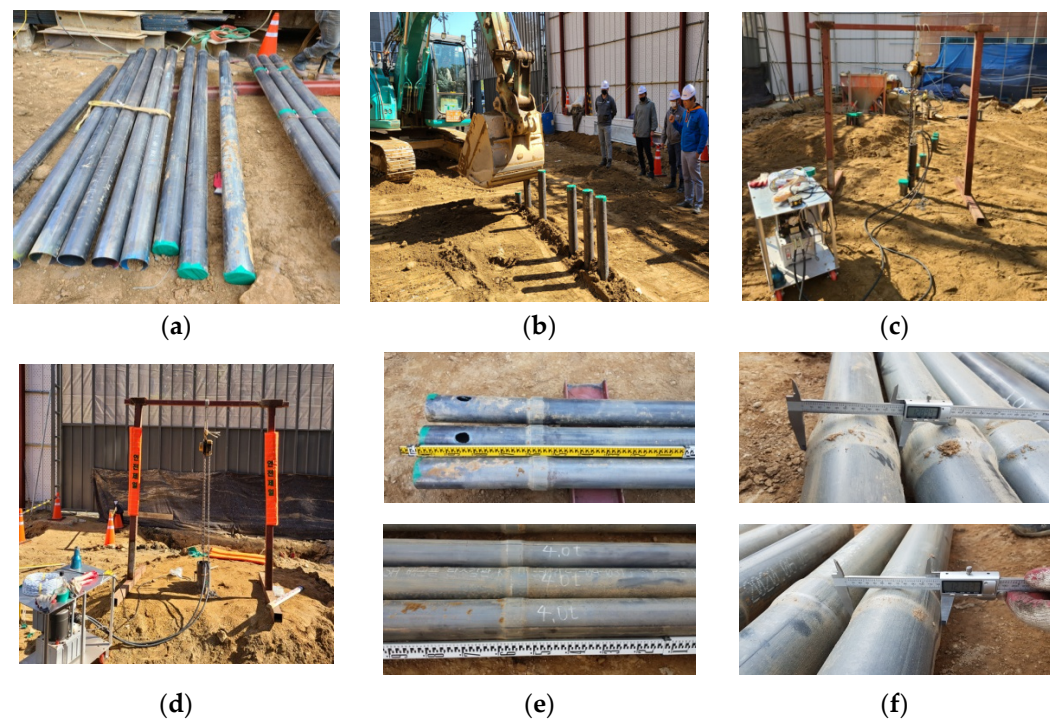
Test bed experiment process for prototype of hydraulic expansion equipment: (a) Preparation of steel pipes; (b) Insertion of steel pipes into ground; (c) Insertion of prototype of hydraulic expansion equipment into steel pipe; (d) Expansion of steel pipe using prototype of hydraulic expansion equipment; (e) Configuration of expanded steel pipes; (f) Measurement of expanded diameter.
